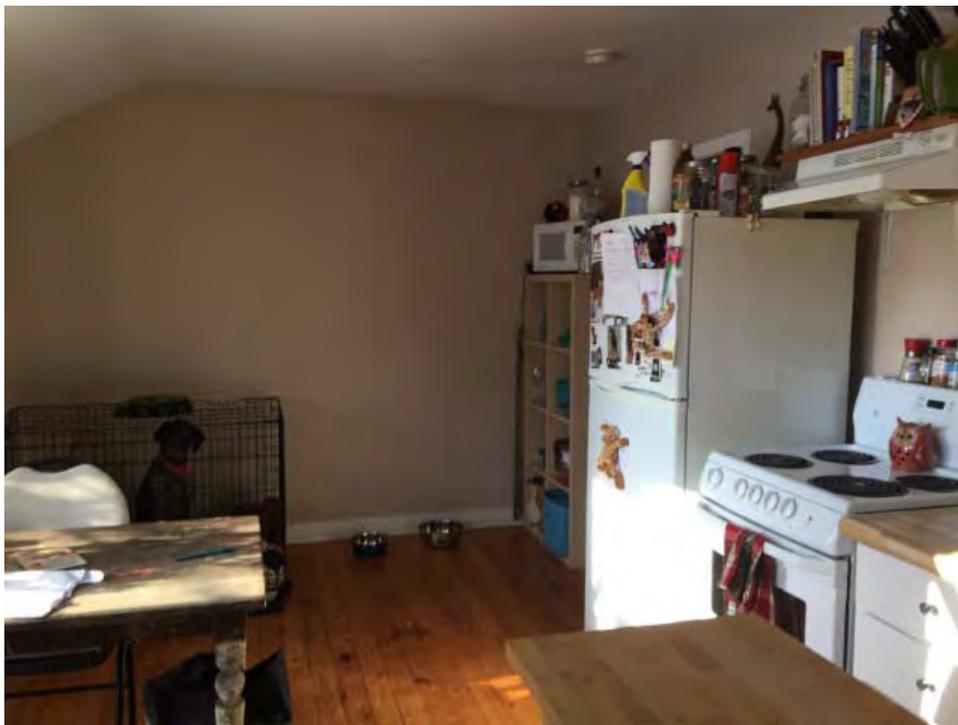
View of the kitchen located in one of the apartment units on the second floor of the main/northwest building. An electric baseboard heating is visible along the southern wall.
